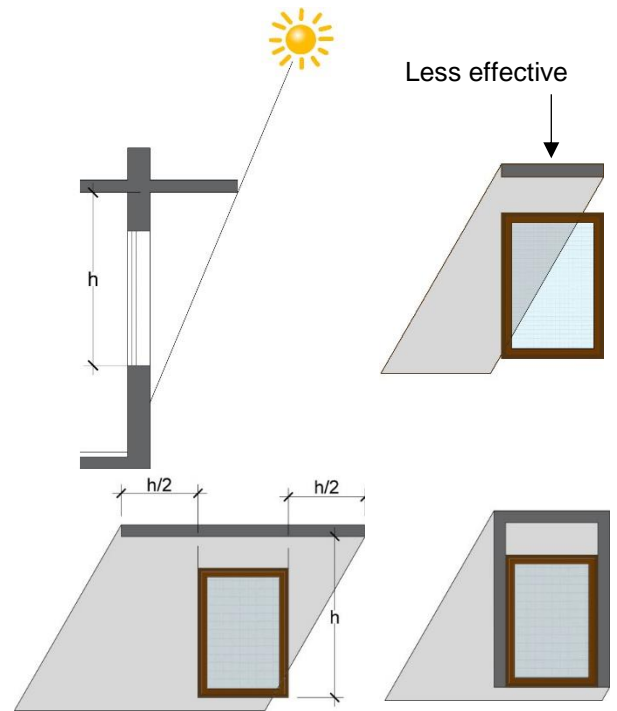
Guideline for designing effective horizontal shading for windows on south façade. Image adapted from: The Carbon Neutral Design Project (8)
